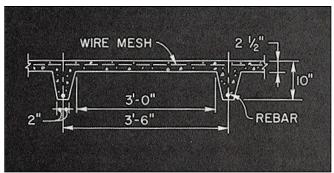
Cross-section of the rib floor system shows standard 3 foot-6 inch rib spacing which permits 3-foot-wide foundation wall forms to be used as deck forms.
